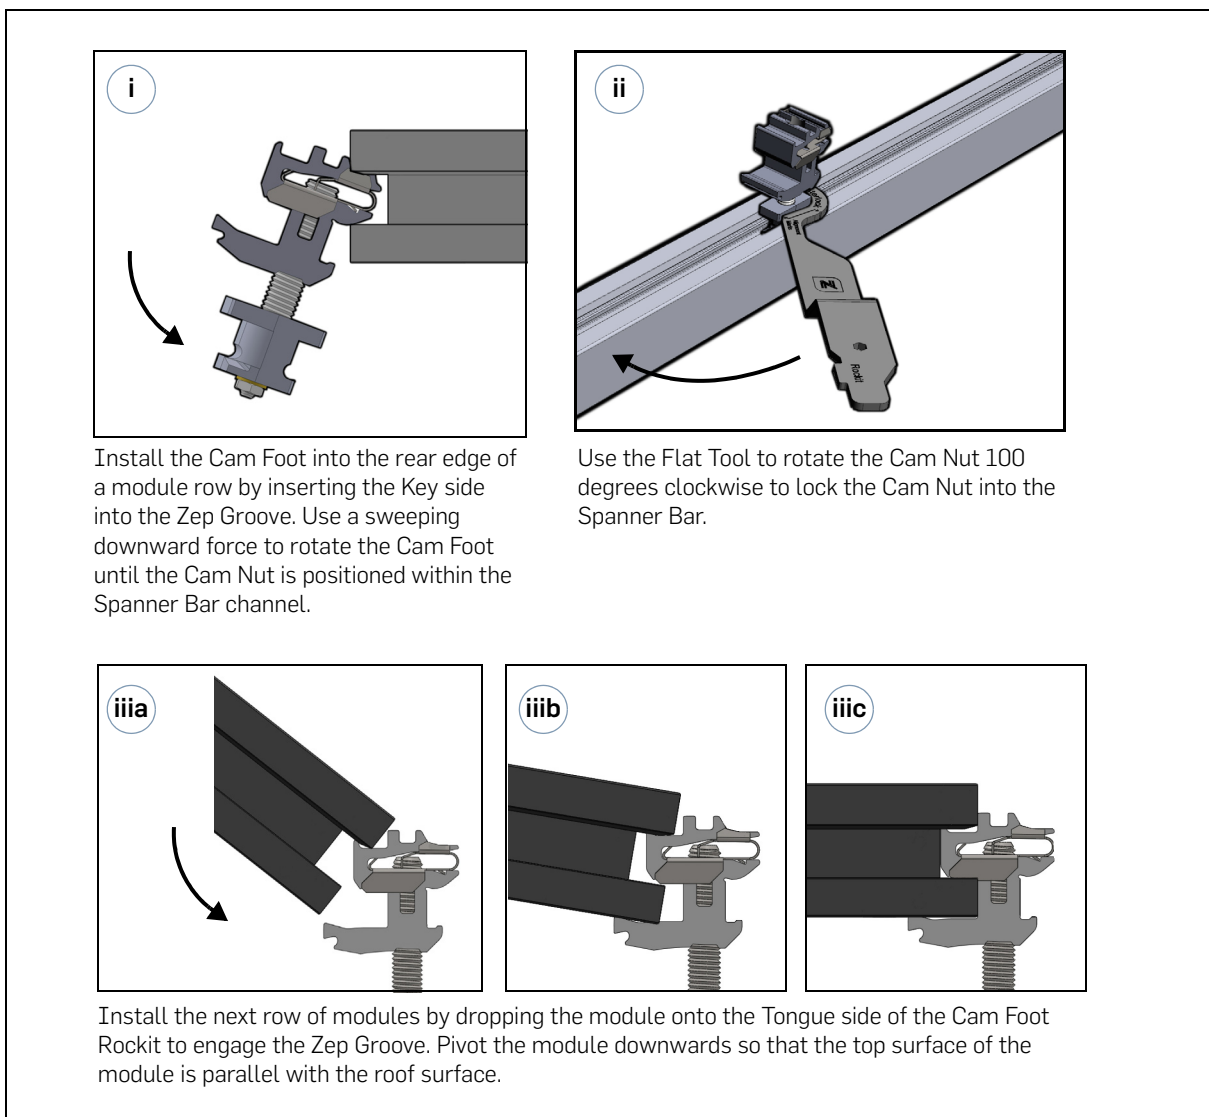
Cam Foot Installation - Zep Groove and Spanner Bar
